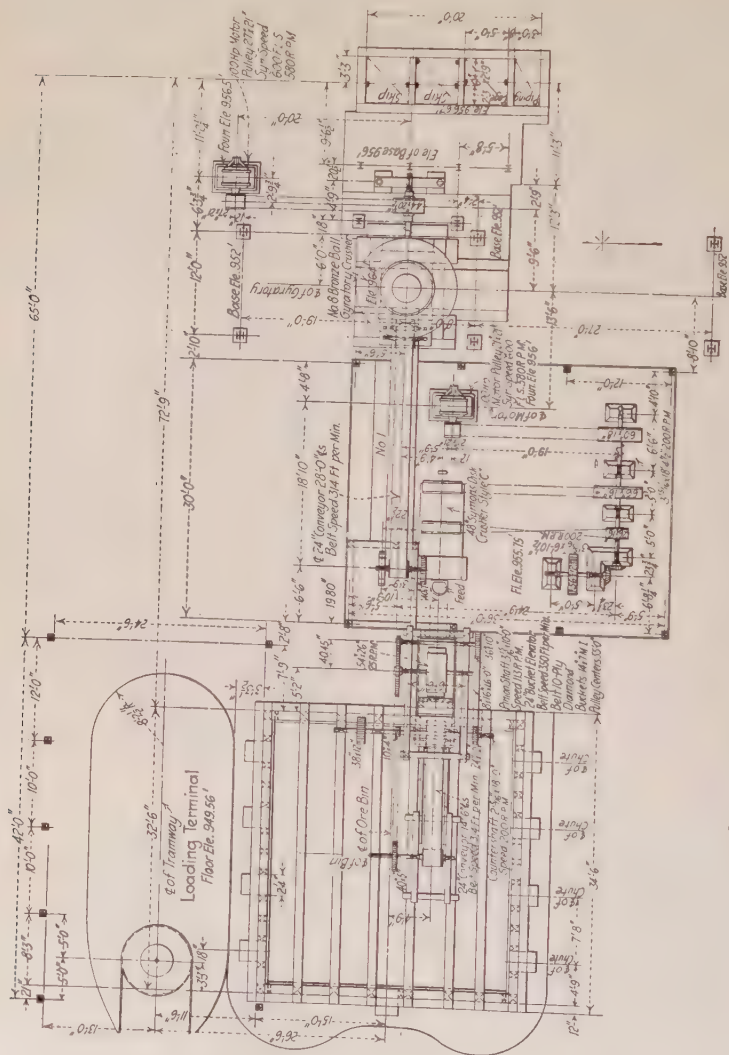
PLAN OF No. 2 CRUSHING PLANT, AS INSTALLED.
